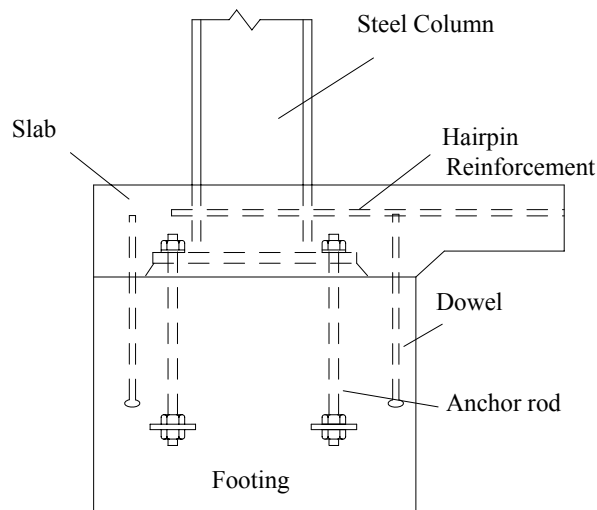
Junction embedded base plate in a reinforced slab with the footing
